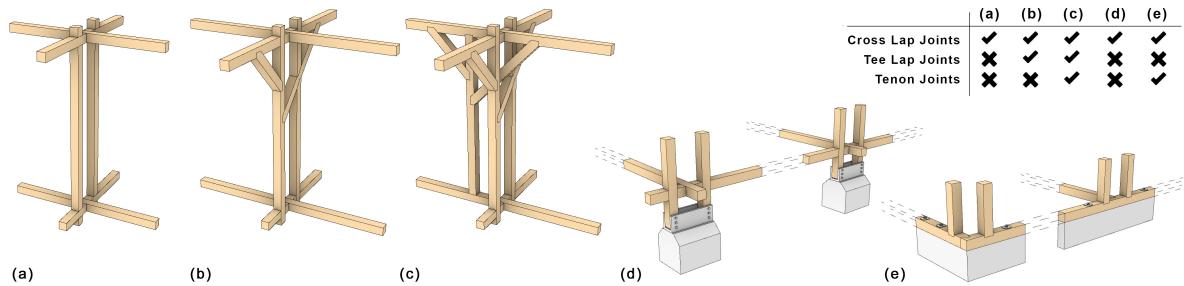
Various framing details and the types of joints used. Post and beam arrangements with (a) no stiffening brace (b) one pair of braces (c) two pair of braces. Post and plate arrangement, connected to (d) isolated foundation and (e) perimeter foundation.
